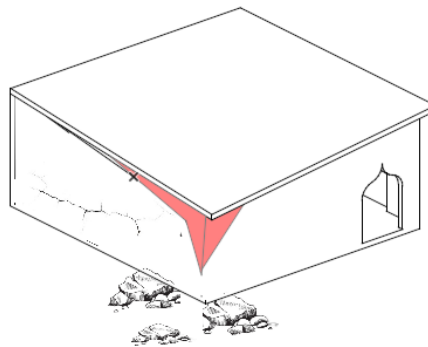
Damage caused by the roof at wall corners or on top of the wall (6a); Shear damage between the roof and the walls (6b), particularly due to inadequate reinforcement interventions in the past or lack of maintenance
